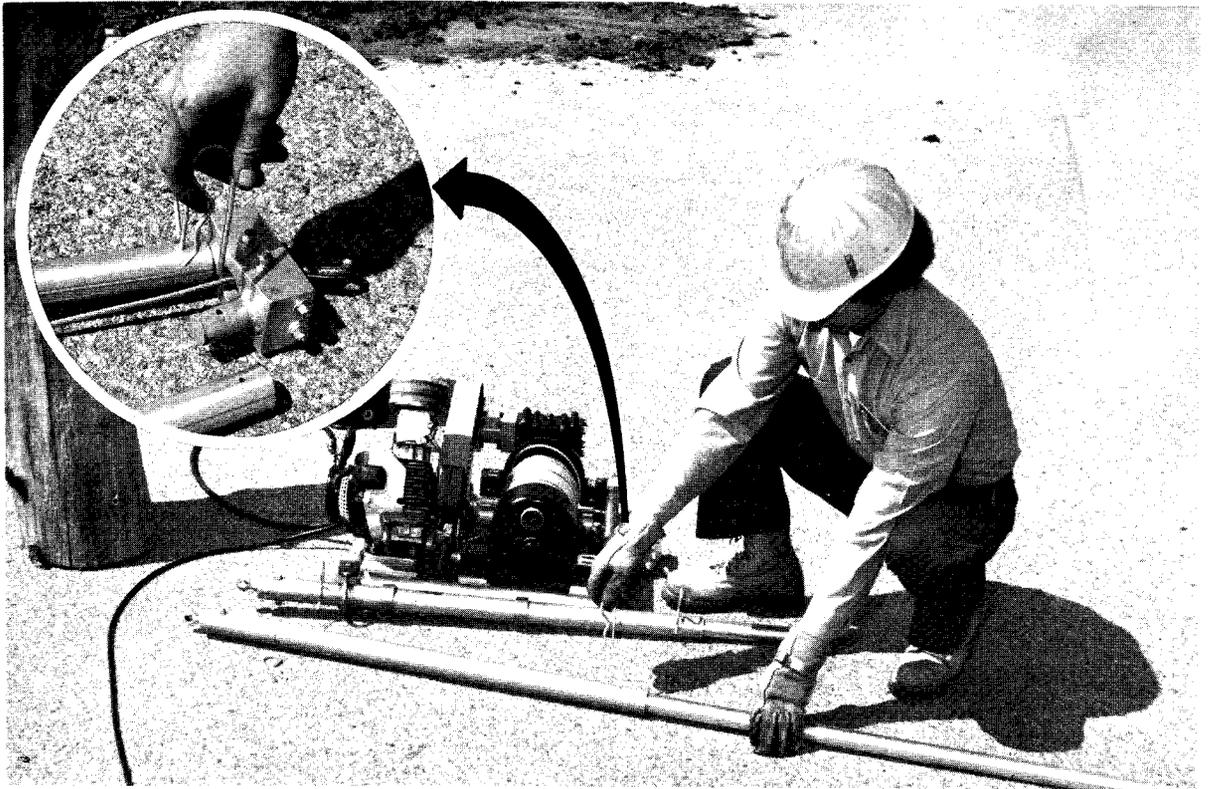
Removing and extending carrying handles to construct the fairlead assembly.
